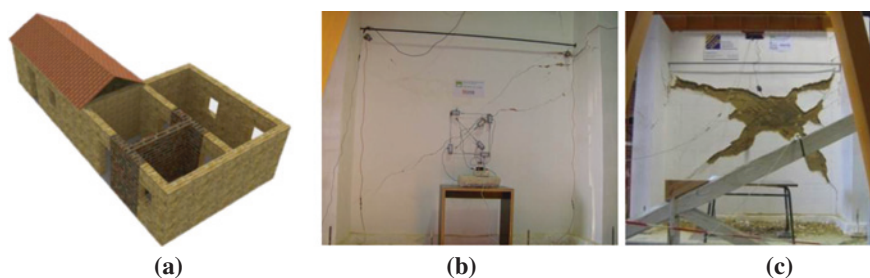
Cyclic test on the double-T wall. a 3D View of the idealized adobe wall. b Final damage pattern of the original wall. c Final damage pattern of the strengthened wall
